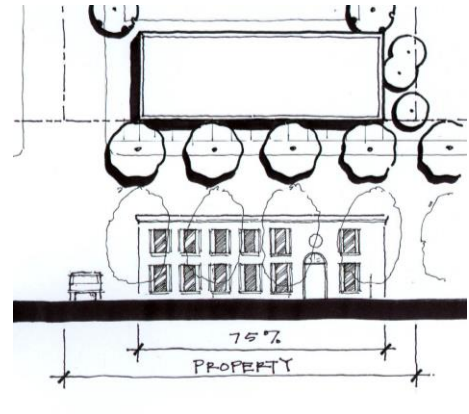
Building facades shall occupy at least 75% of the lot frontage at the front building line.
